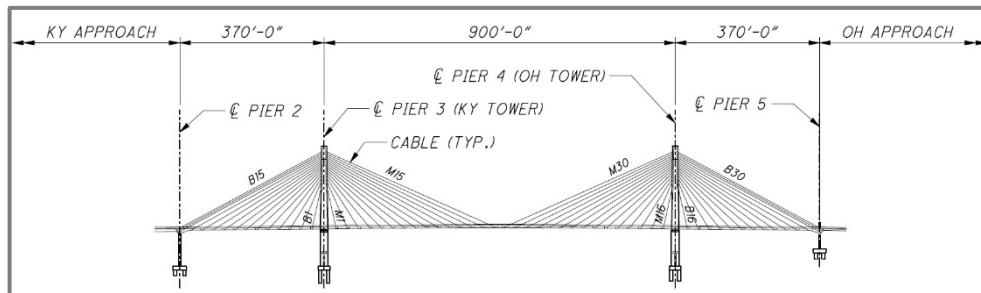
LAW-93-0.00 Bridge West Elevation (taken from the 2010 design drawings)
